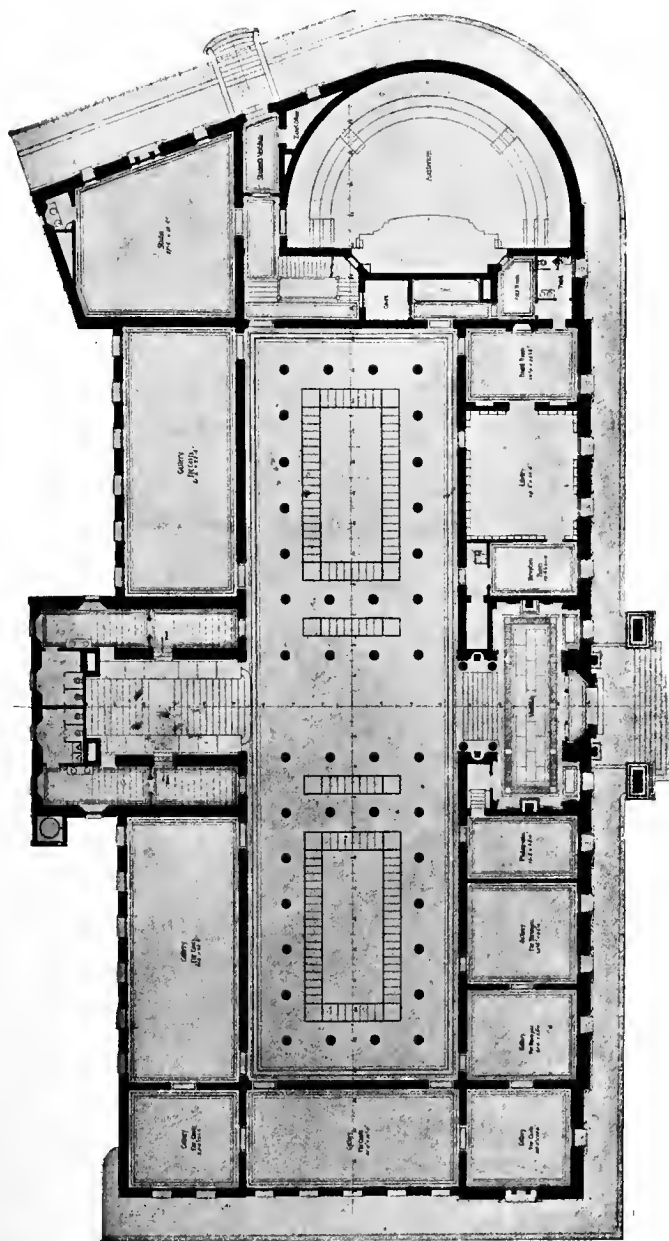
PLAN OF THE GROUND FLOOR OF THE CORCORAN GALLERY OF ART, WASHINGTON, D. C.
